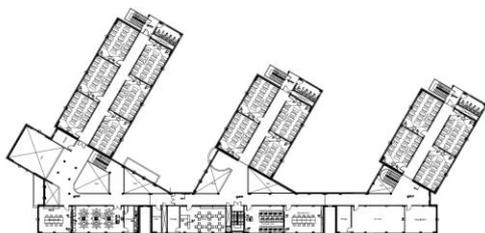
New Abu Alanda school–first floor plan (Al Bitar, 2007).
